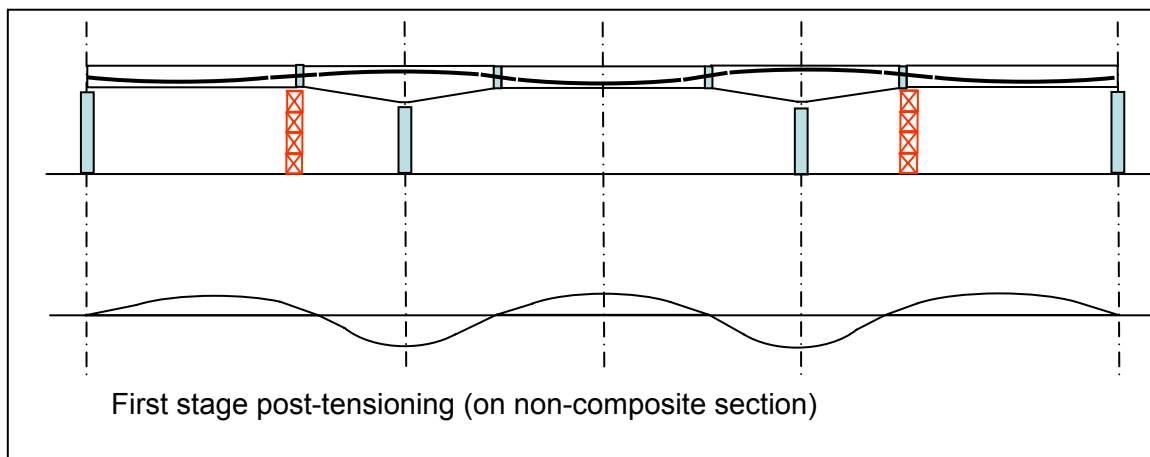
Spliced Girder Construction - Stage 1 PT Moments
